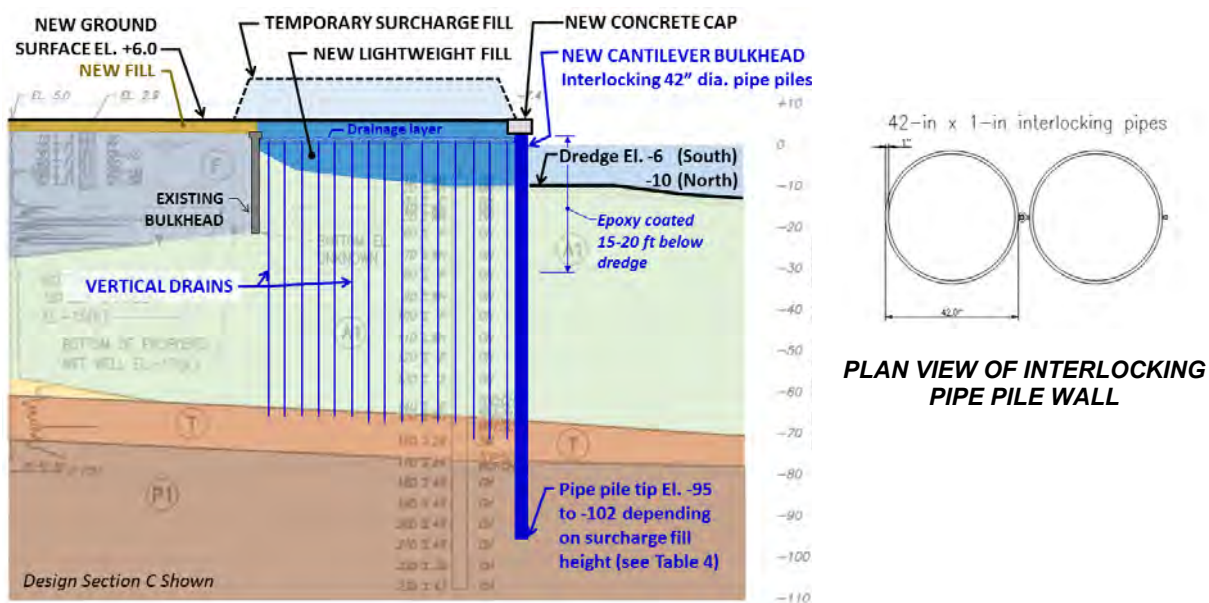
New Cantilever Bulkhead Concept (Offset Alignment)
